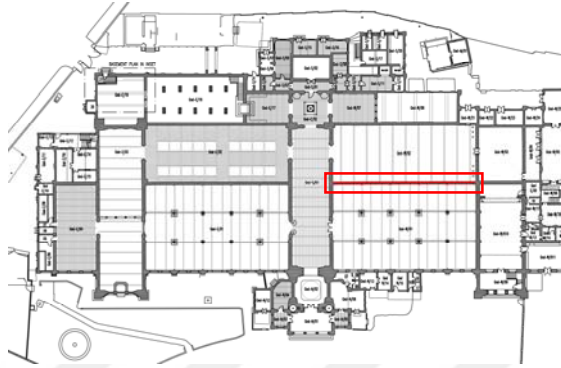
Key Plan showing wall Gnd-W/01-S-W
